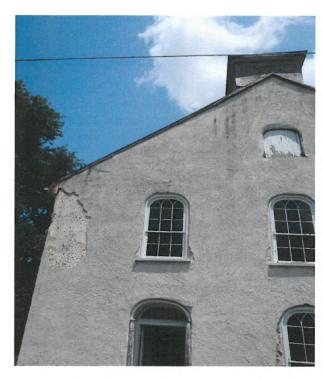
#8: Exterior: Pictures showing the exterior finishes and overview of the conditions along the walls of the church.
